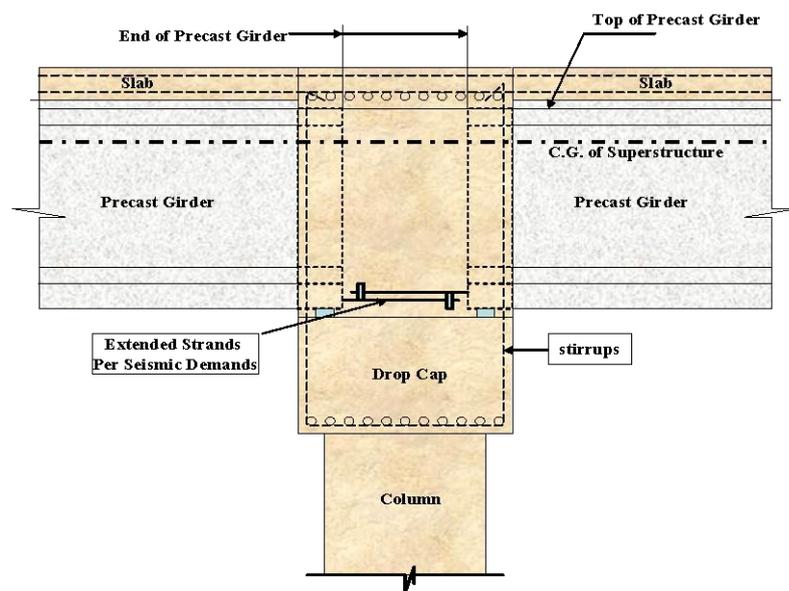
Pier with Girders Framed into the Pier Diaphragm
